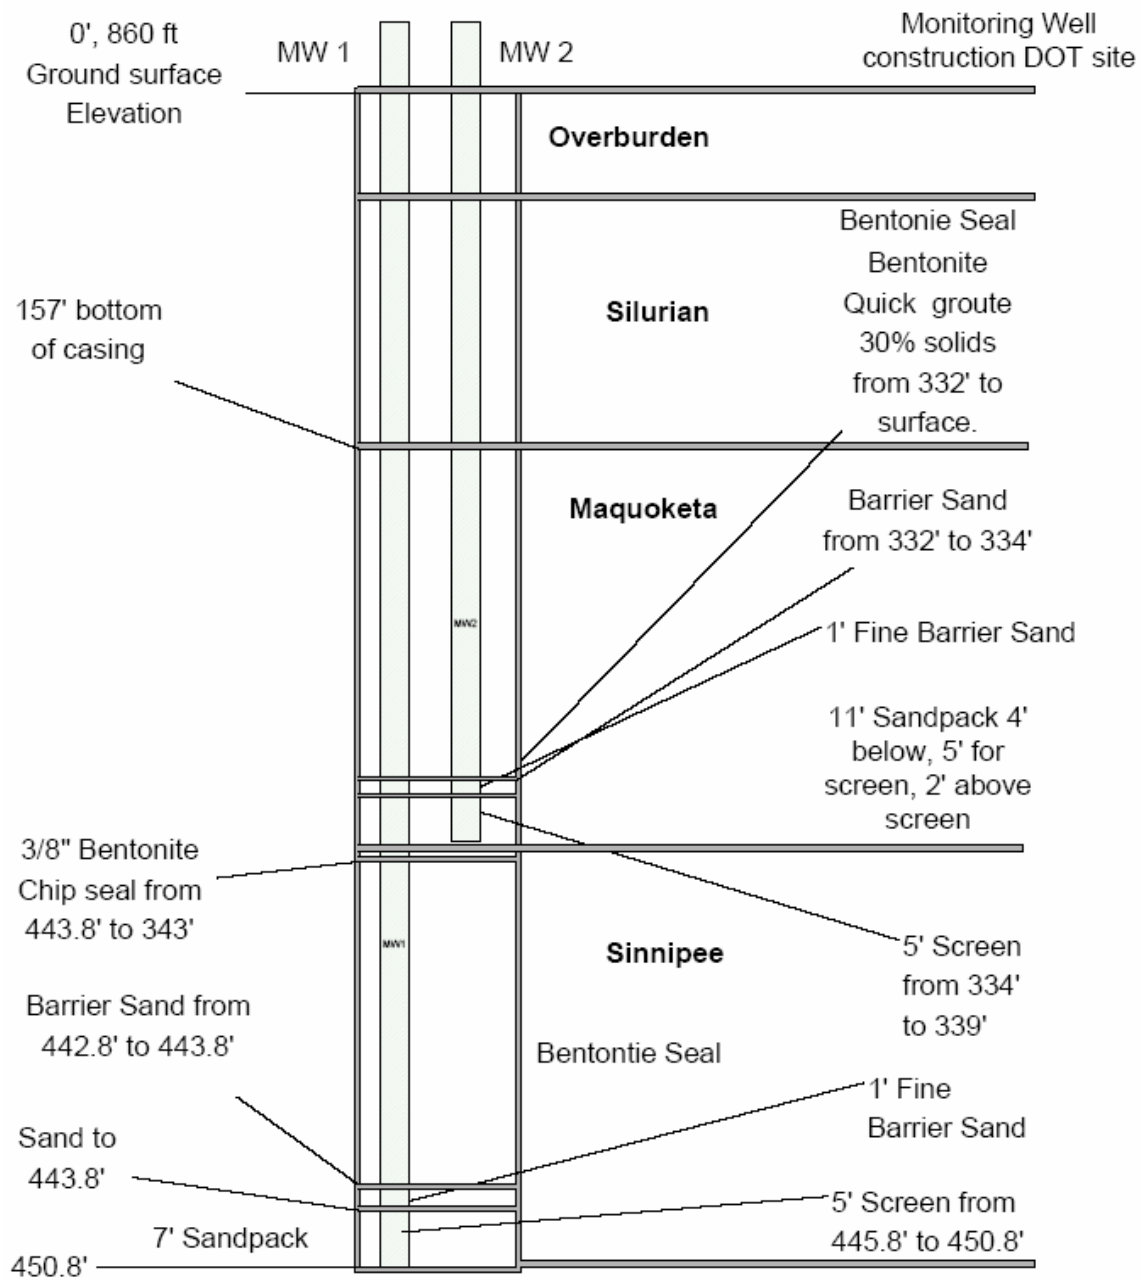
Construction diagram of piezometer nest at well Wk-4234
